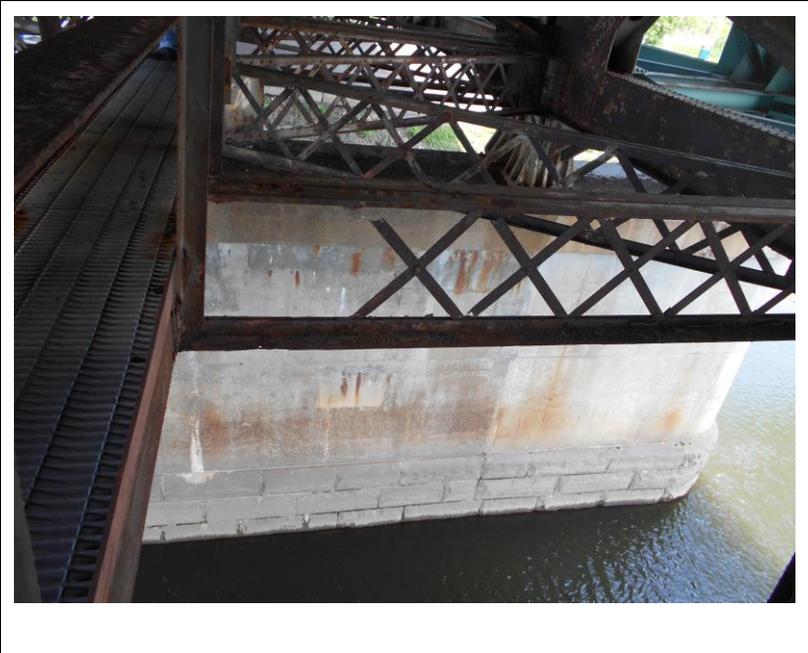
Bridge No. 00571A, Corrosion of Cross Bracing Member and Gusset Plate.
